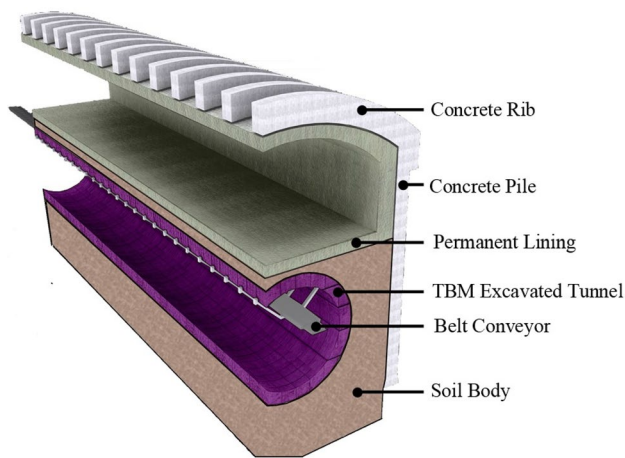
Tunnel construction before station construction strategy in PCAPS techniques
